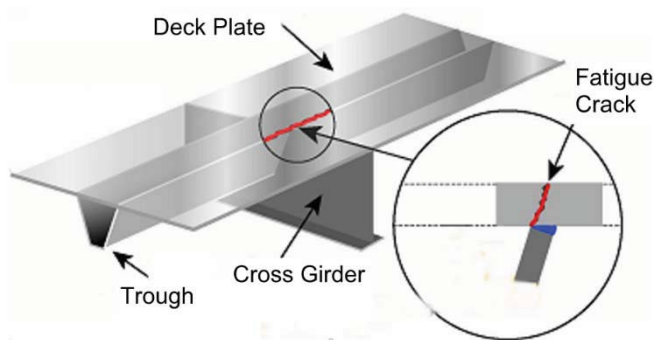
Fatigue crack in orthotropic steel bridge deck
